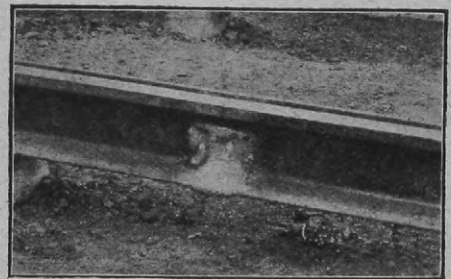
A FINISHED THERMIT WELD ON TRAMWAY RAIL.
